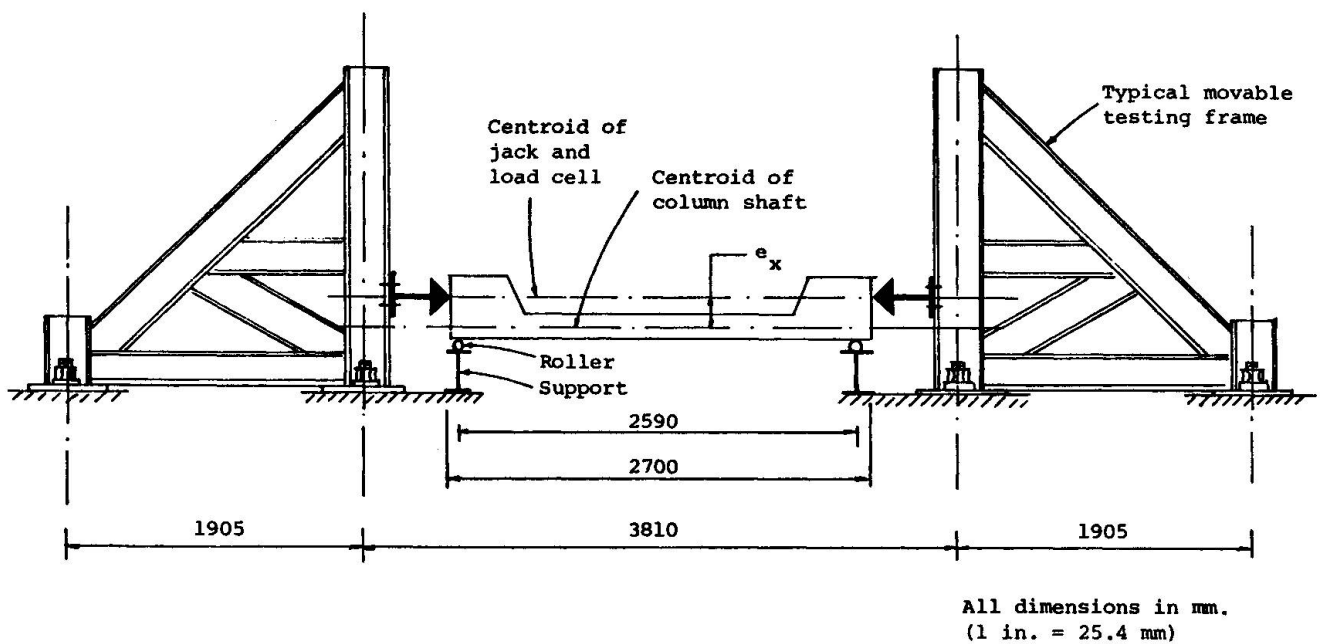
Set-up of Testing Eccentrically Loaded Columns
